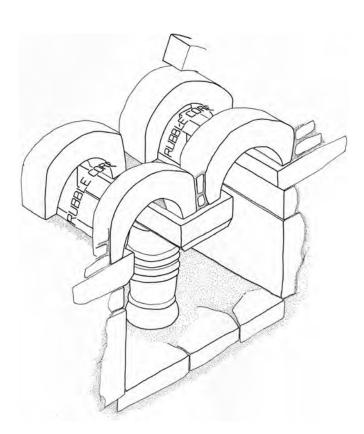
Tower: Stage 1B. Isometric view illustrating the construction of the southern gallery window (seen from the interior). Drawing: Stephen Coll
